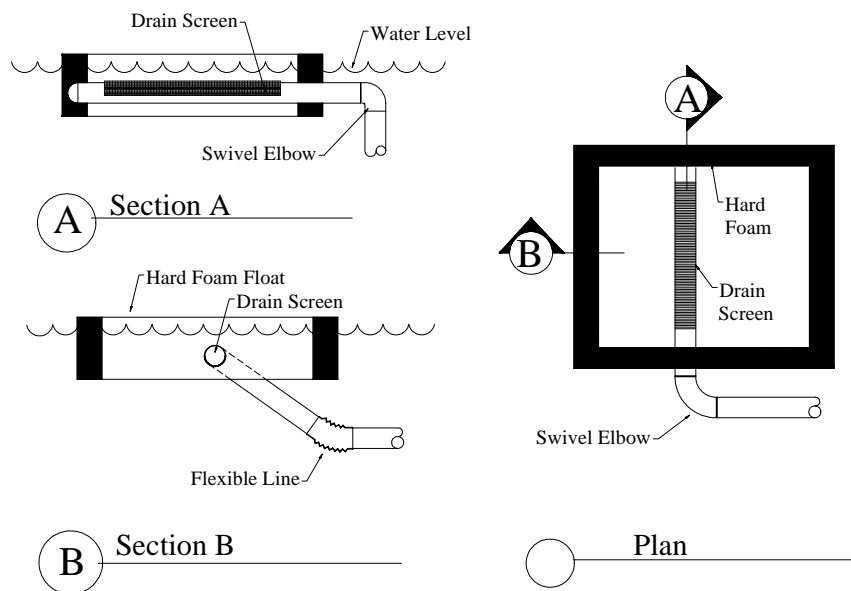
Floating Outlet for Retrofitting Detention Structures.
